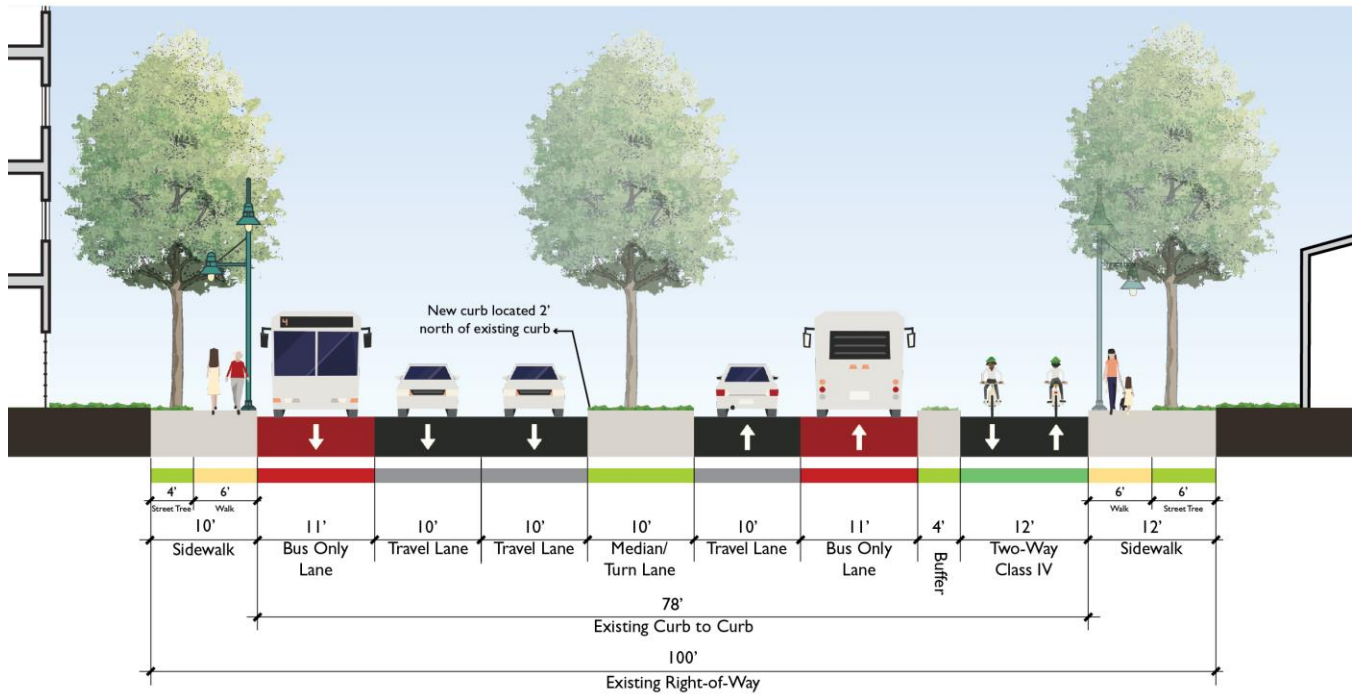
40th Street between Emery Street and Holden Street (looking west) – Typical Mid-block Condition – SECTION F
